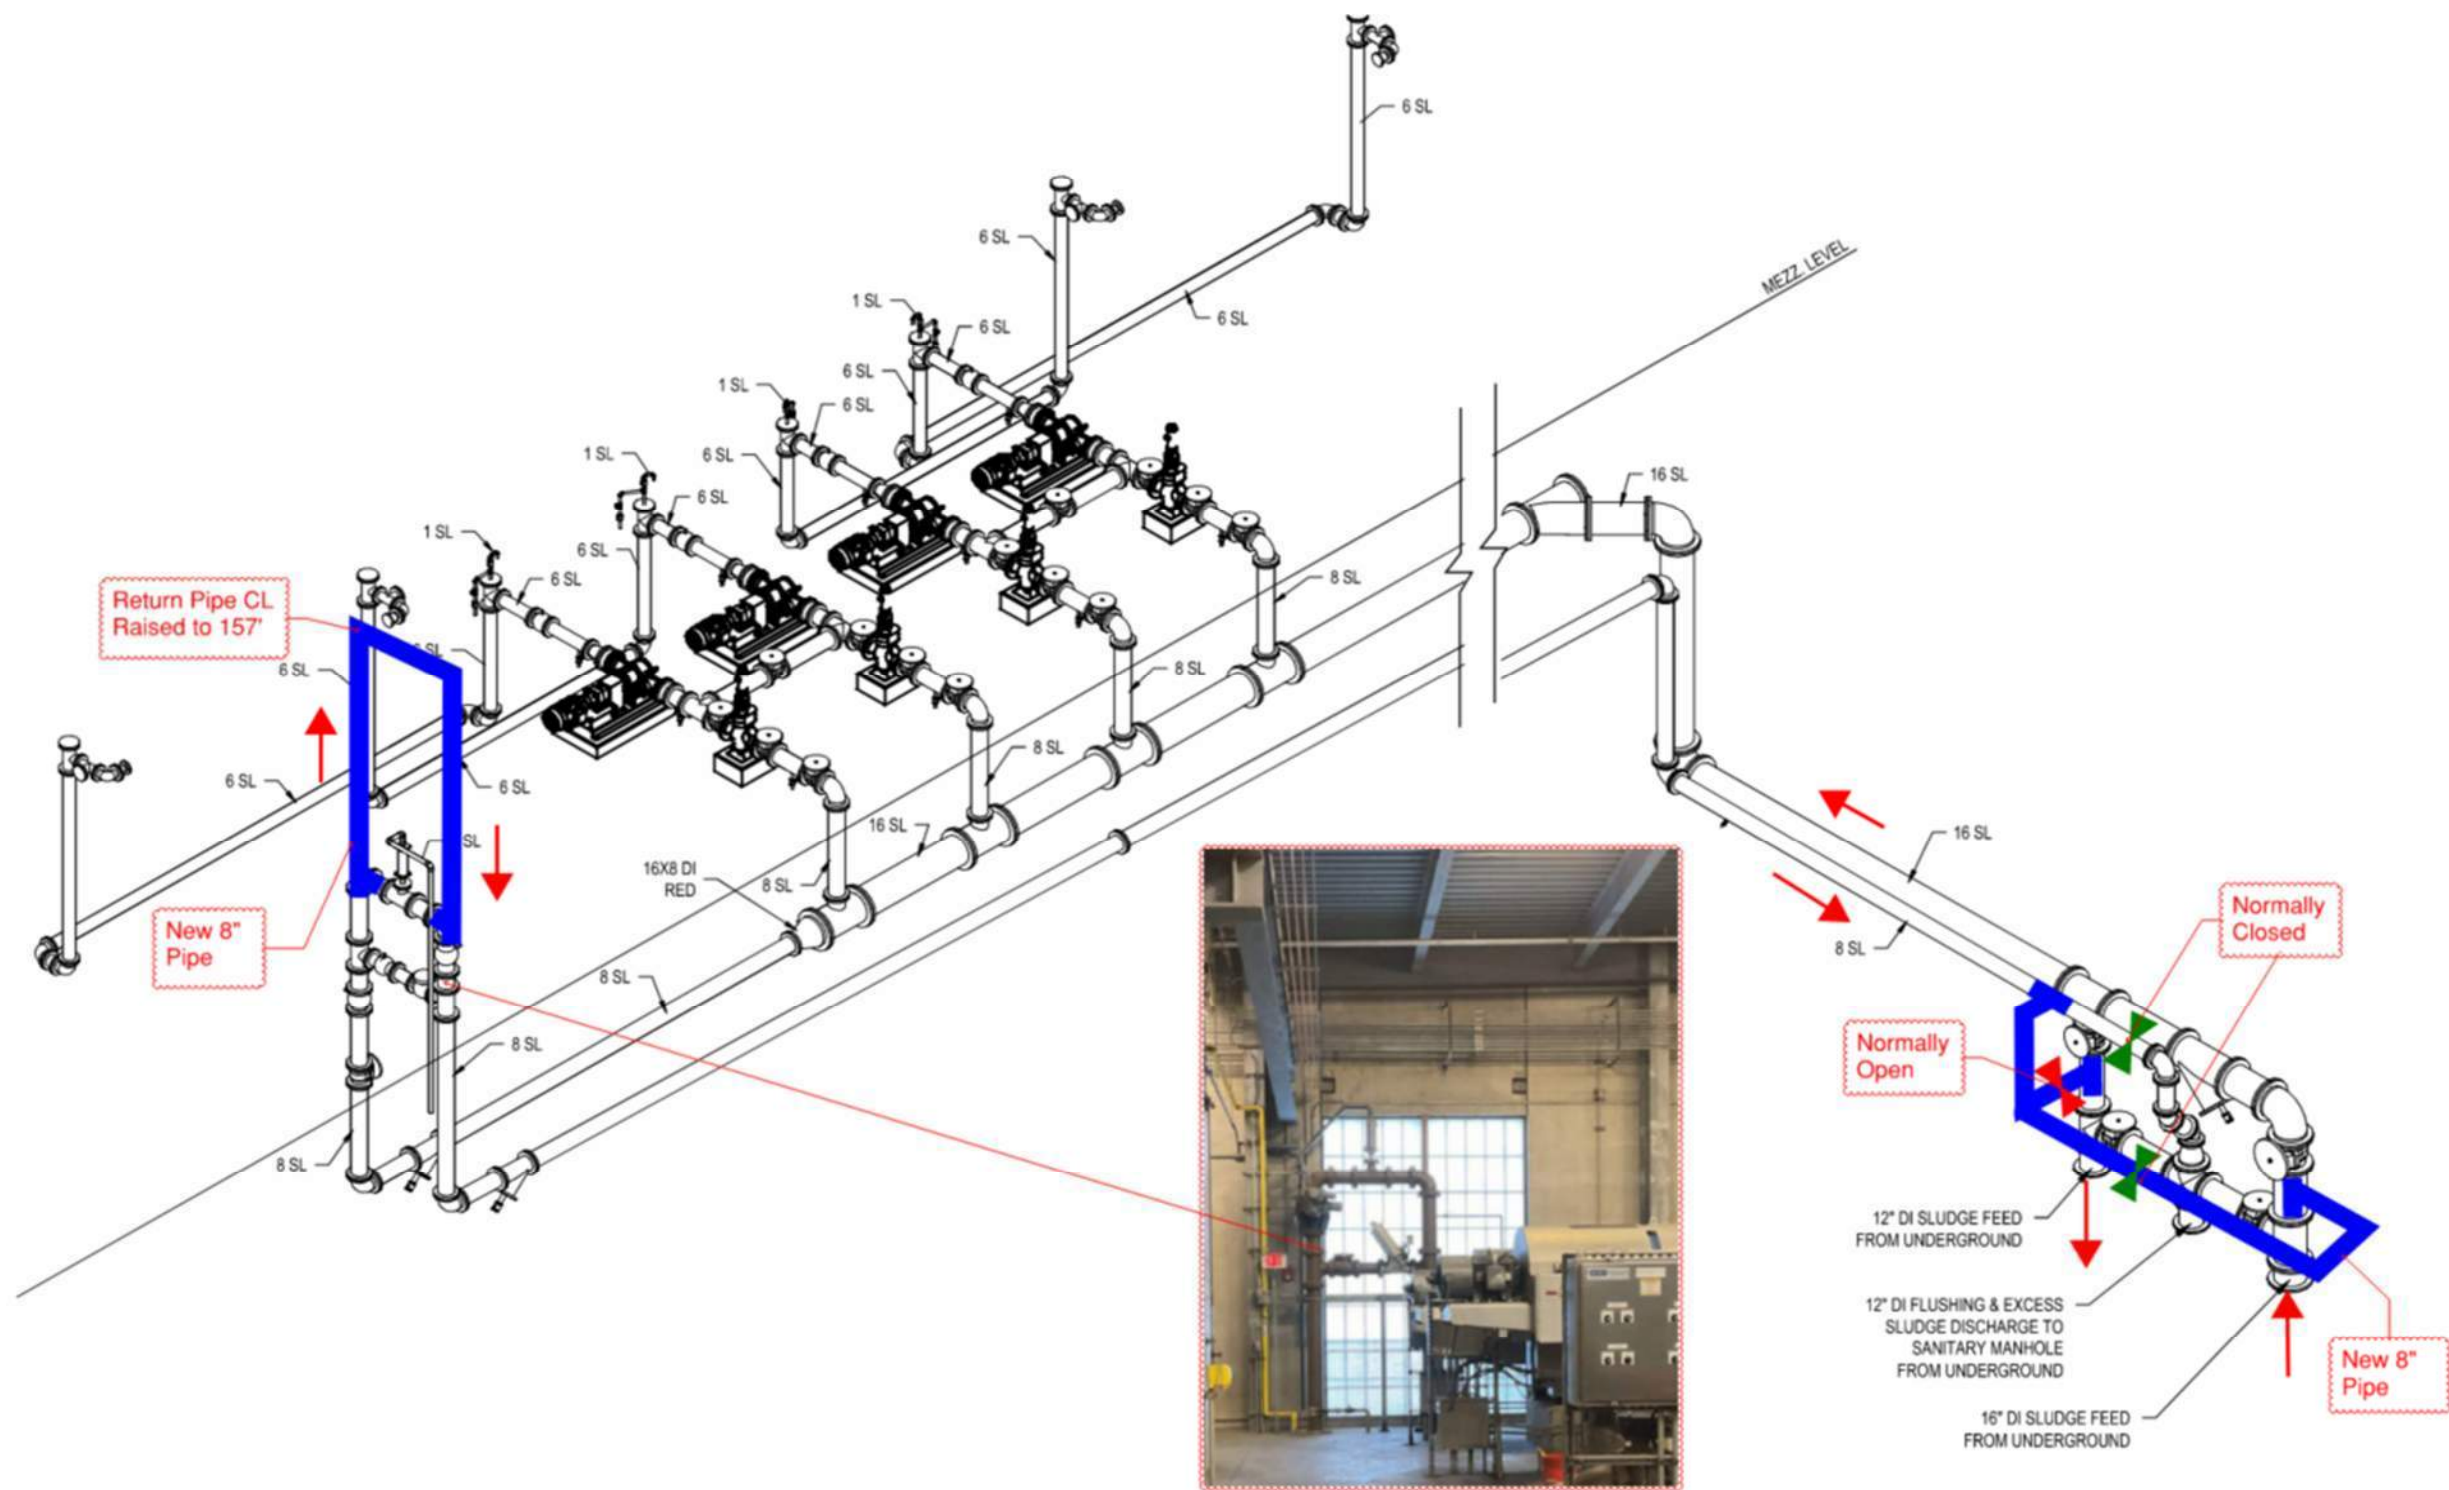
Proposed BDF Sludge Feed Line Modifications at BDF
